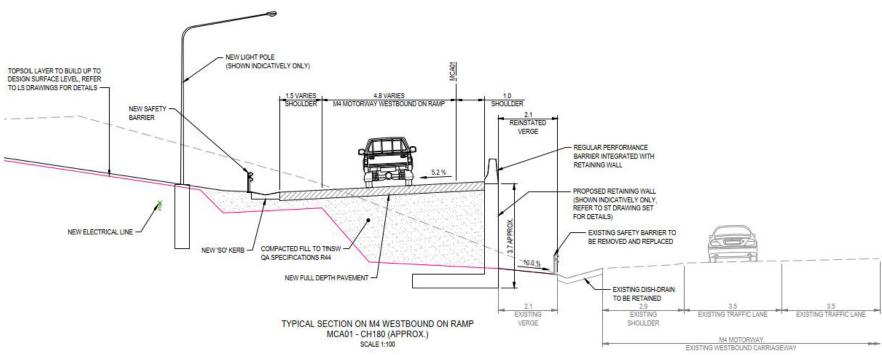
Typical cross section (looking west) on the proposed on-ramp including Retaining Wall A (L-shape retaining wall with Type-F barrier)
